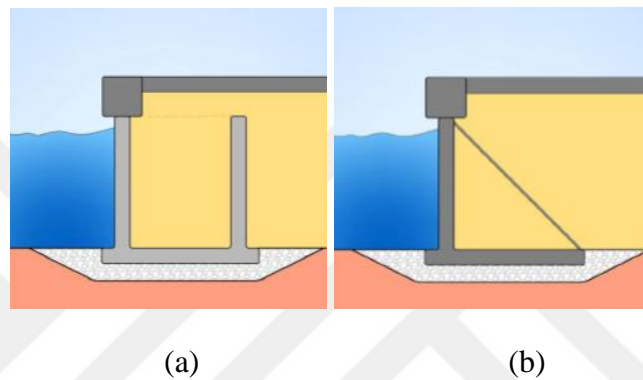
Gravity wall structures a) caisson b) cantilever monolithic (PIANC [28])
